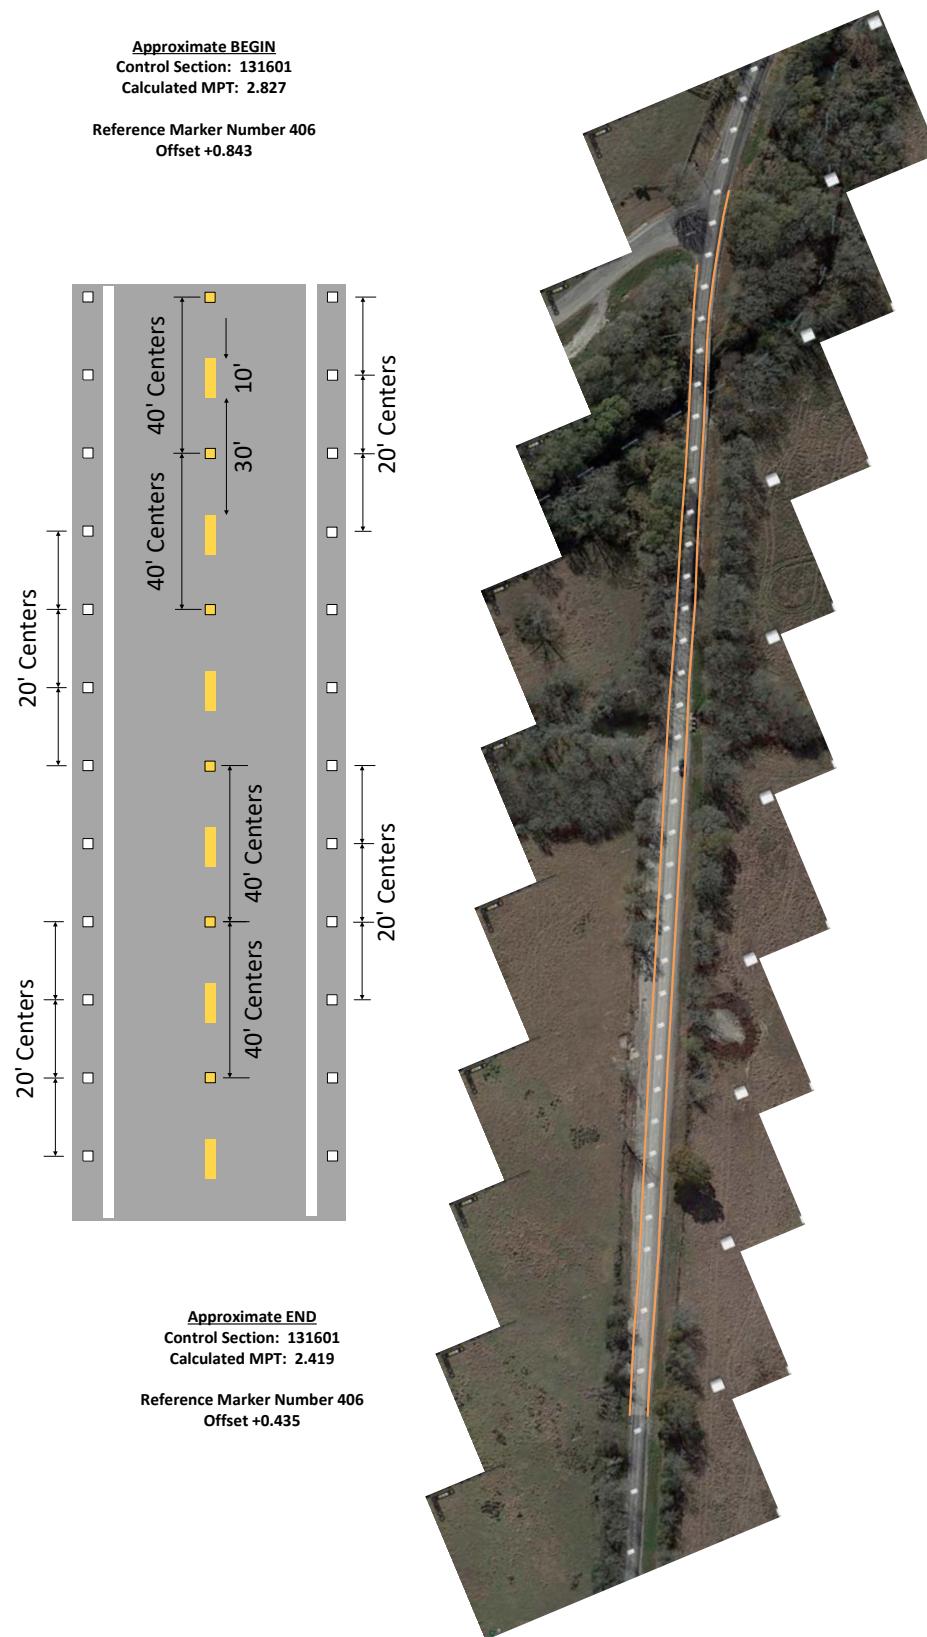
Limits of Proposed Enhanced Pavement Markings for FM 1179.
